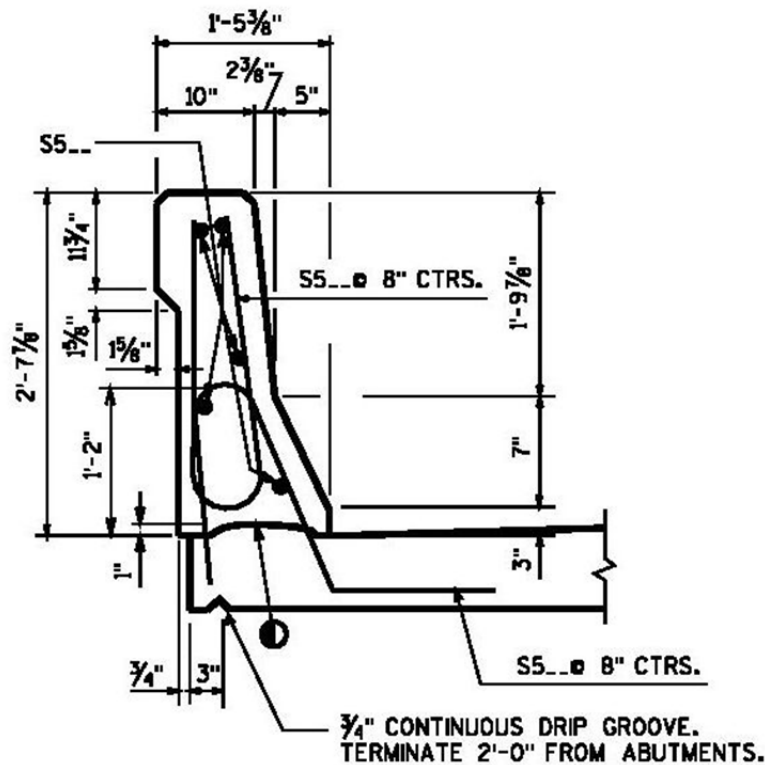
Wisconsin Sloped Face Parapet 'LF' Cross-Sectional Drawing [70]
